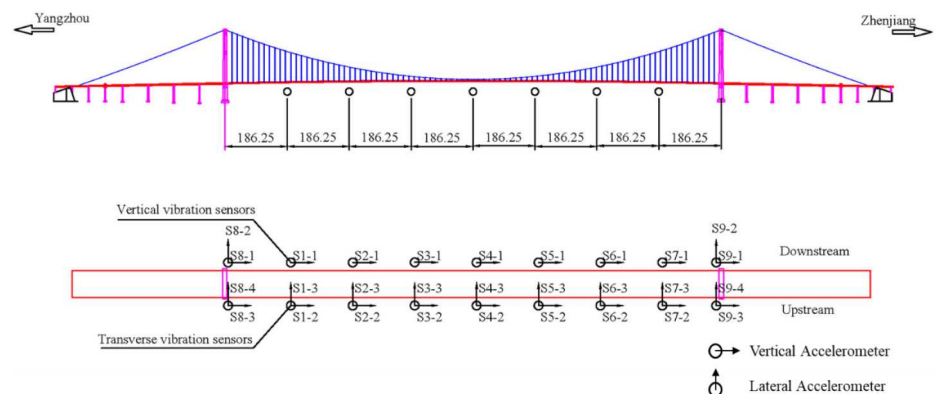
Layout of accelerometers used to monitor bridge vibration. Units = m
